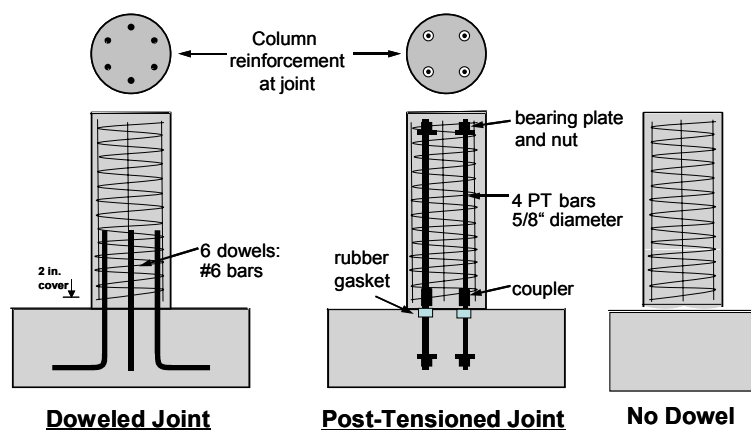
Column-Foundation Joint Configurations.^{5.1}
